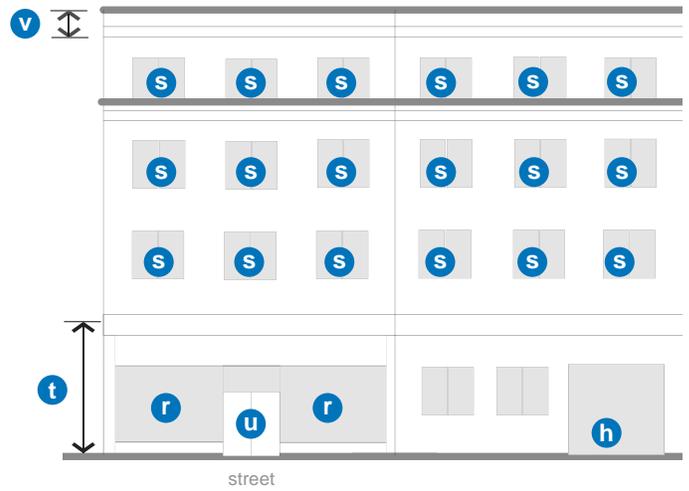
(3). Limited Bay Building: Street Façade Requirements.
